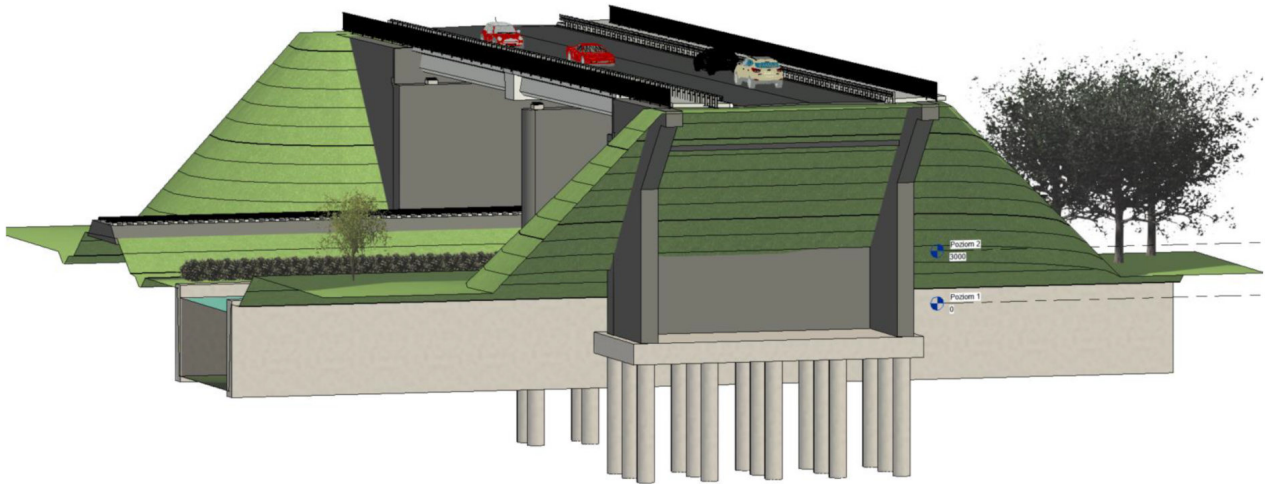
View of the bridge abutment and foundation (WUST team work)
